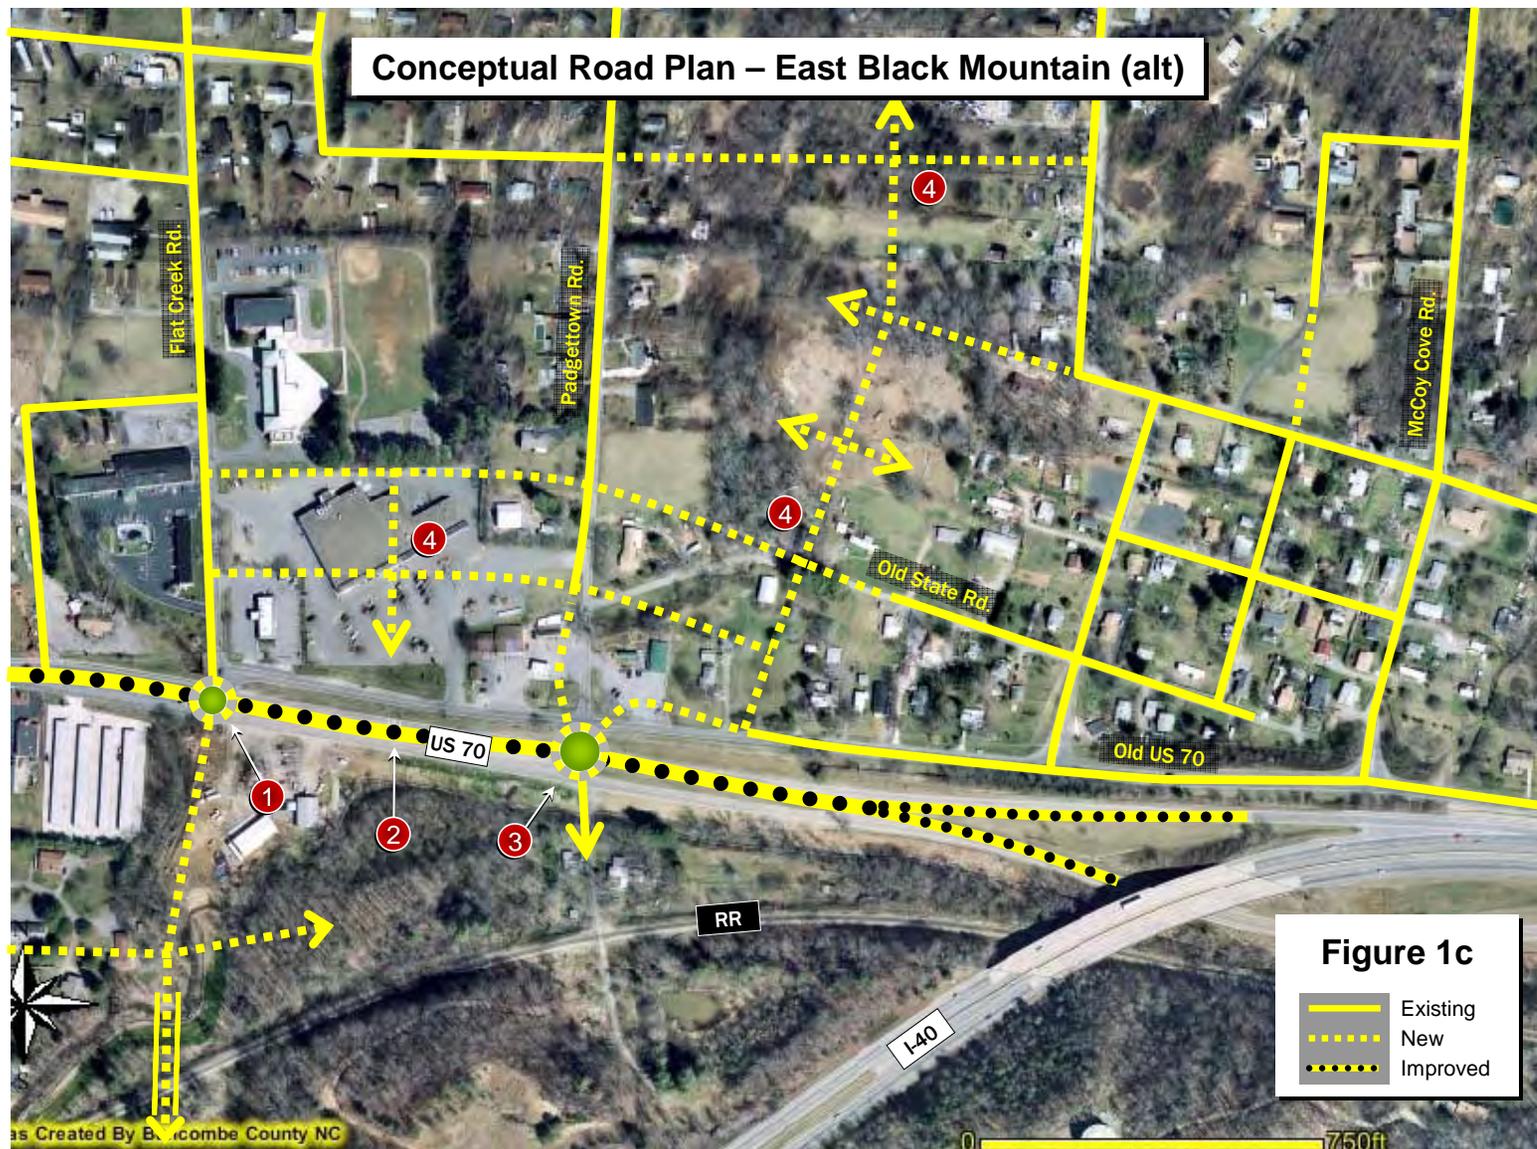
Conceptual Road Plan – East Black Mountain (Alt)
